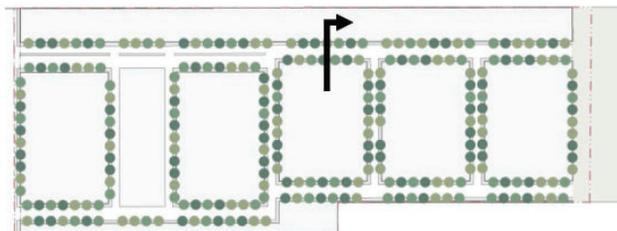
Northern East-West Street - 74-foot Right of Way - Northern
